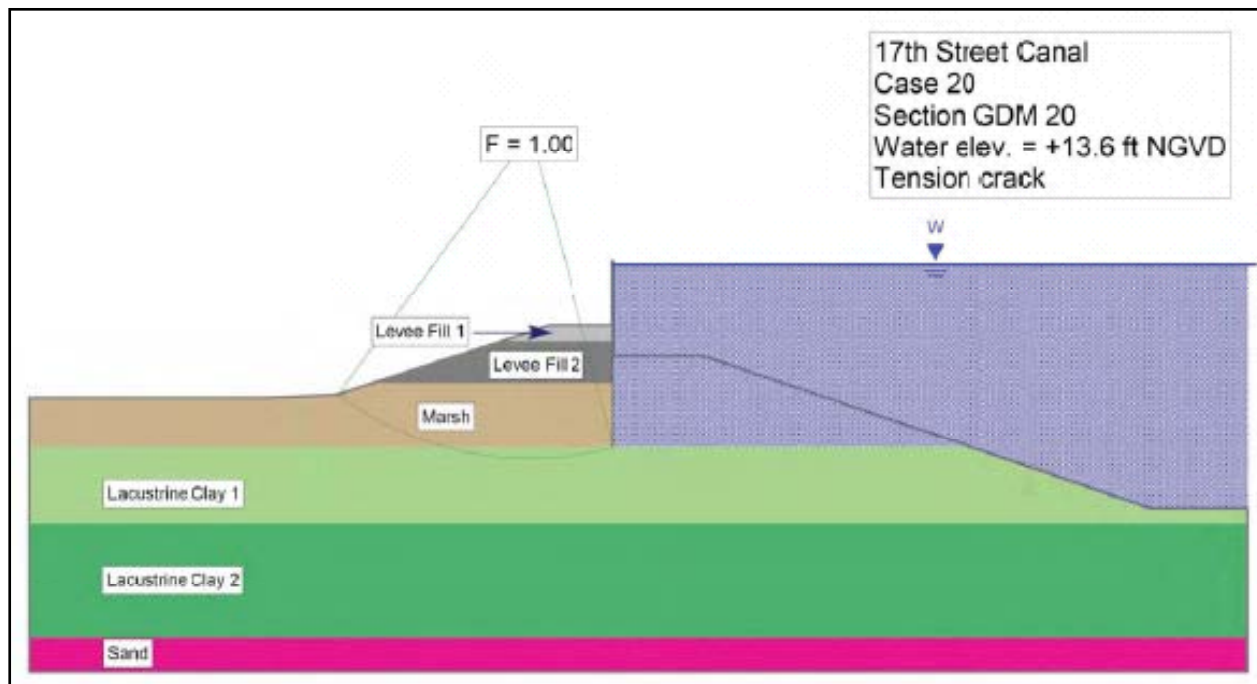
Failure by rotation of I-wall, reducing I-wall elevation
